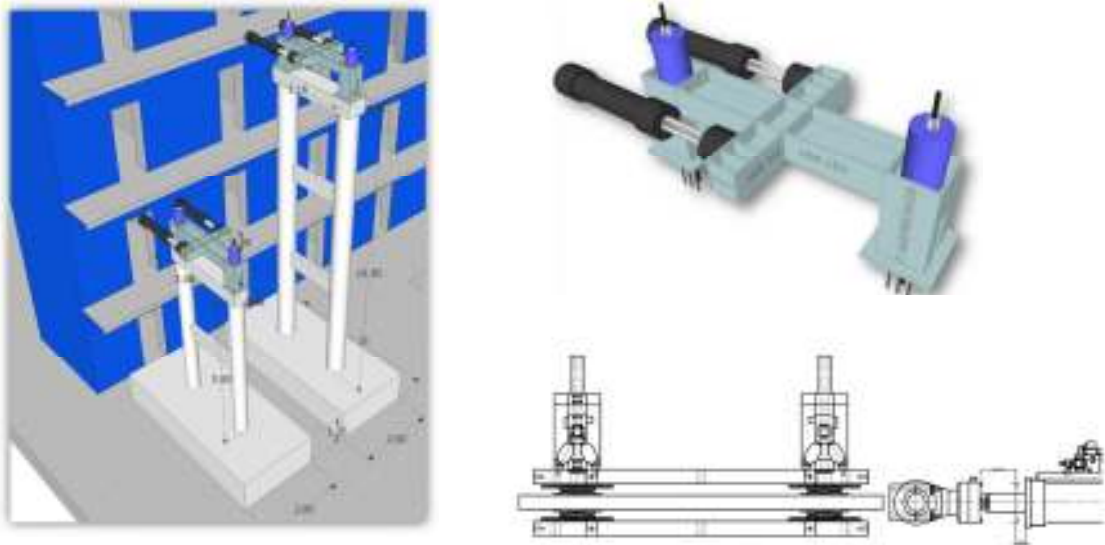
(a) The two piers to be tested, (b) Horizontal and vertical load systems (c) Seismic Isolation setup
